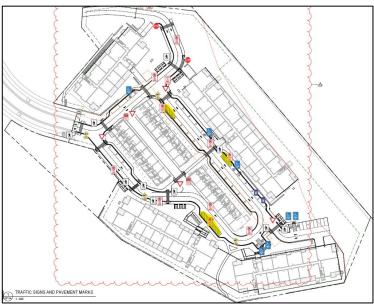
Loading stalls (marked in yellow) in relation to proposed building locations.
